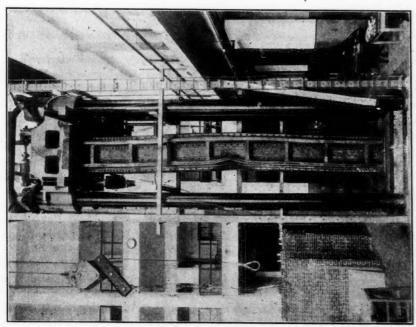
TYPICAL FAILURE, A SILICON STEEL TEST COLUMN.
